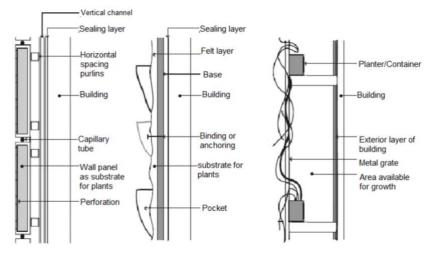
Components on Green Walls Modular Systems, Felt System, and Indirect Green Façade. Source: Green Construction in Building Renovation [30]
